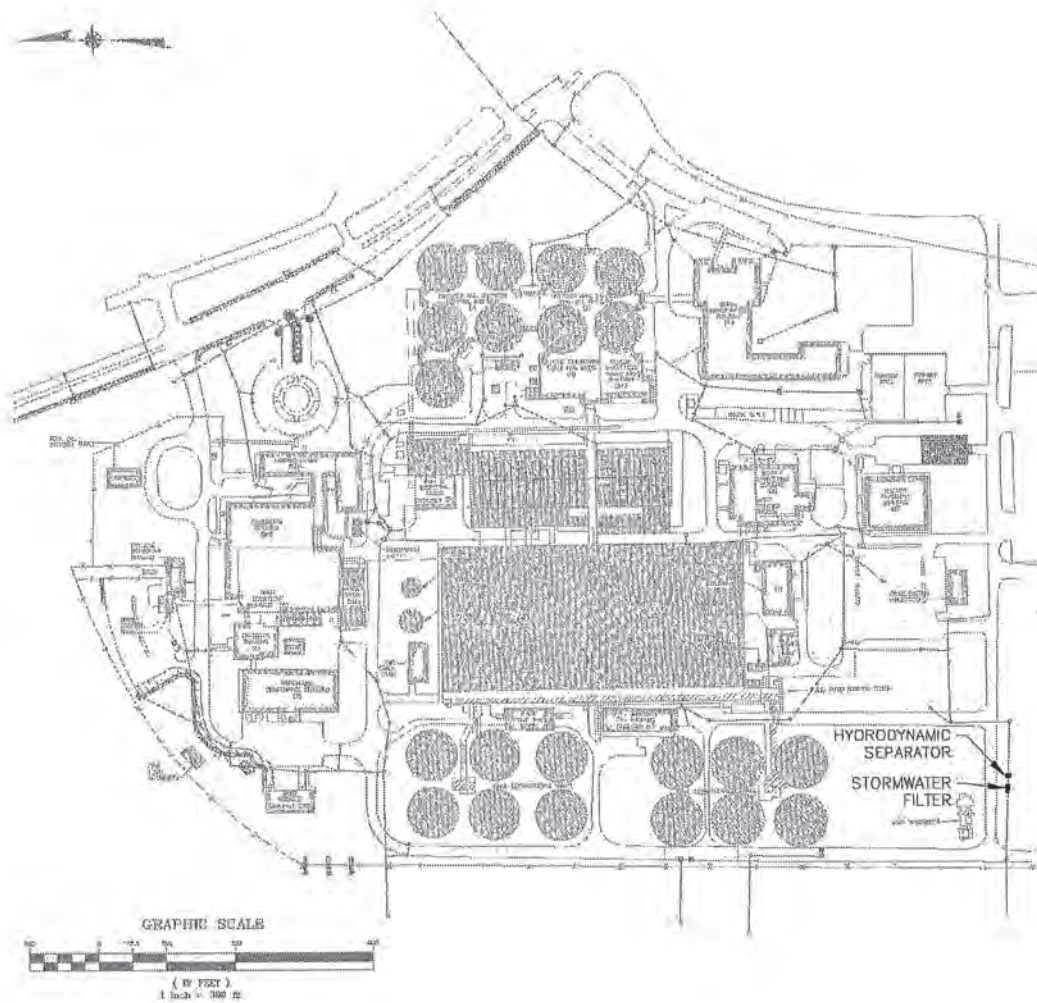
Cedar Creek WPCP Stormwater Filter Location Site Plan
